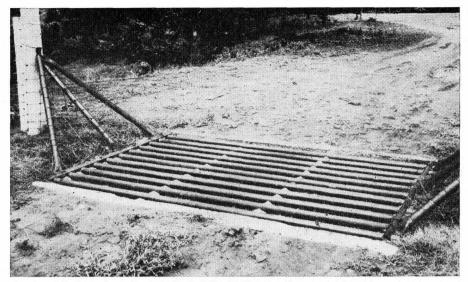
A cattle guard with a grating of iron pipe. The pipes may be removed to clean the pit.
